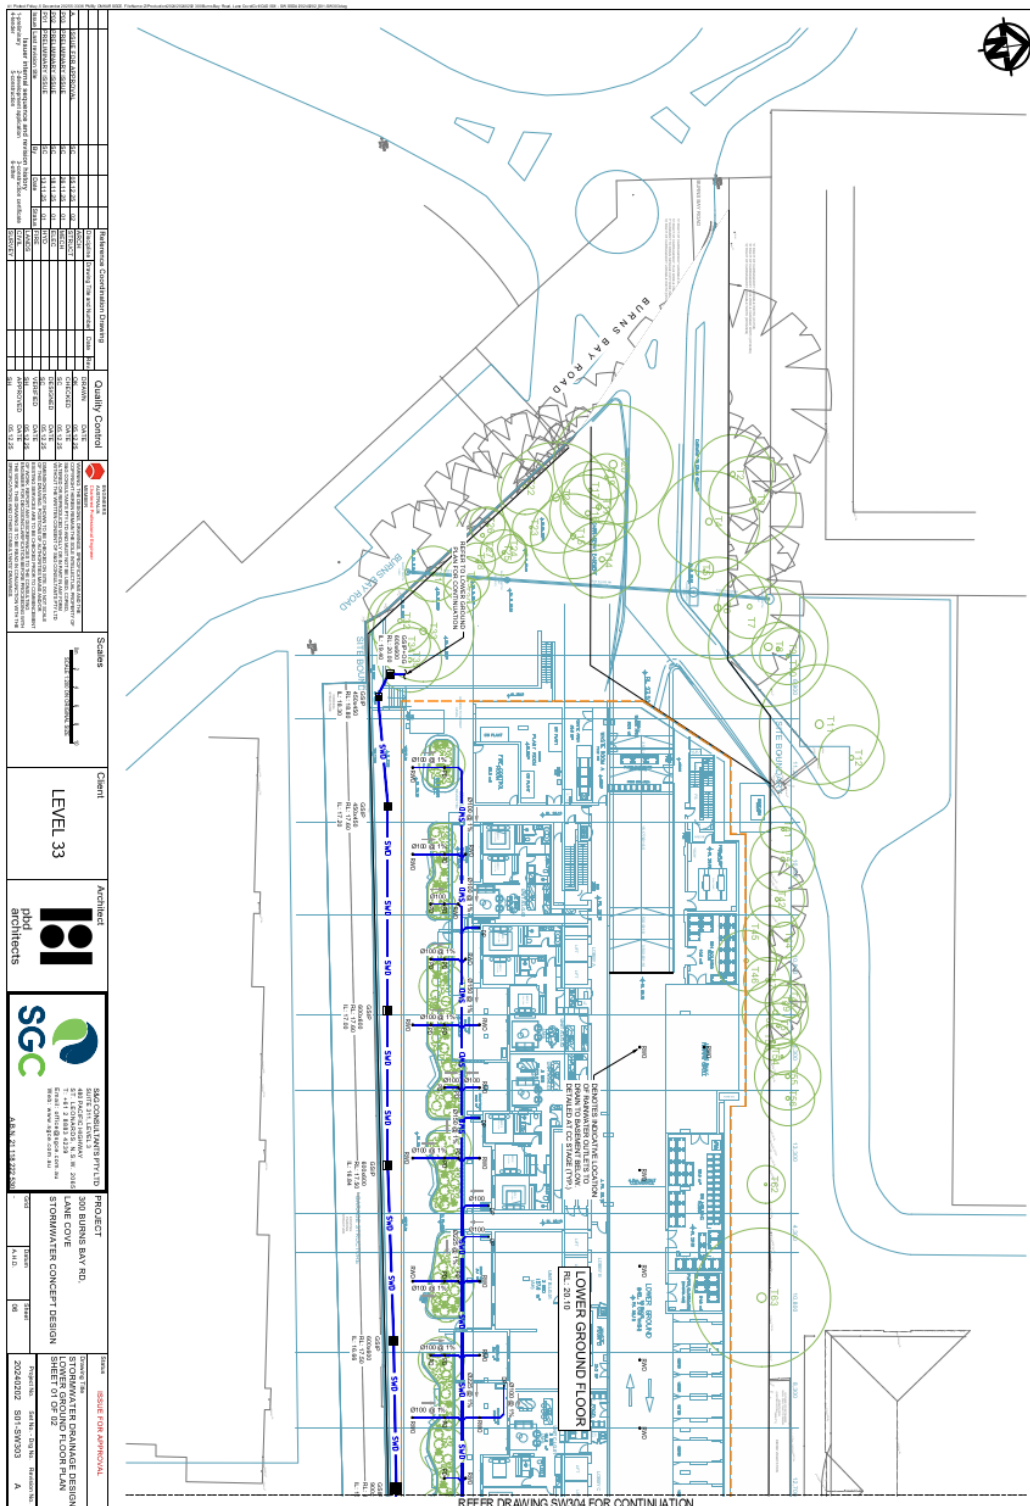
Stormwater Plan – Lower Ground Floor – Sheet 1
